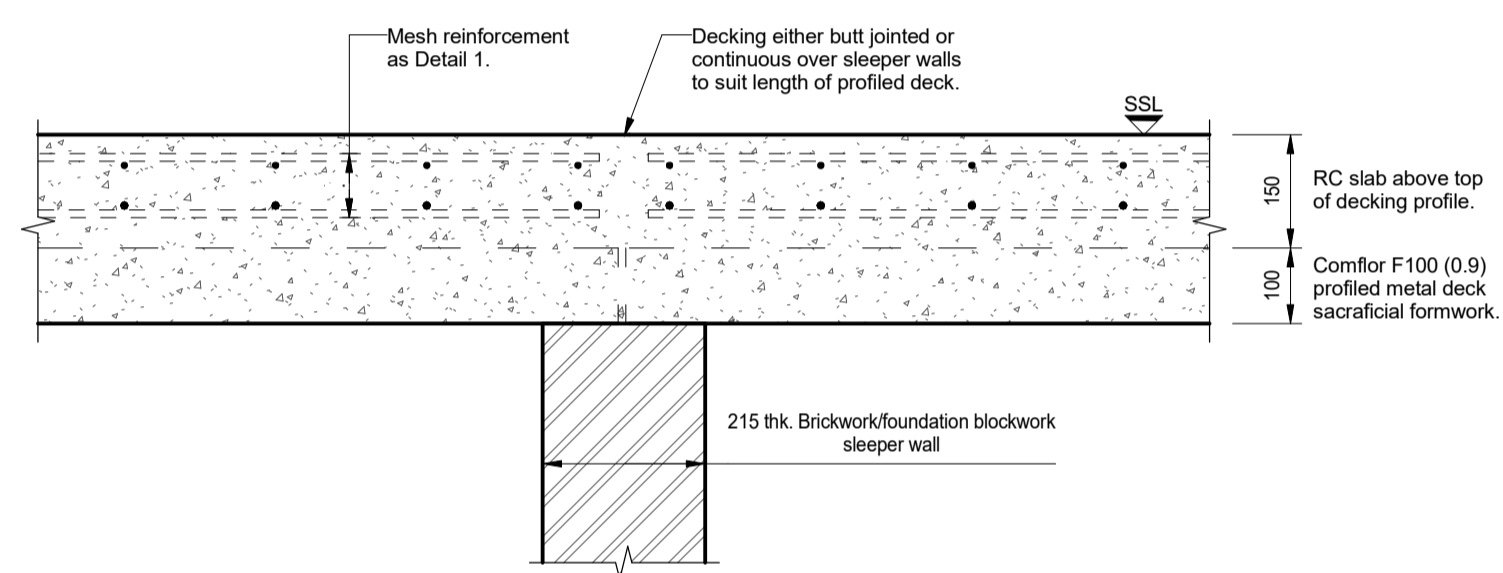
Proposed Bearing onto Sleeper Wall Off Existing Foundation
